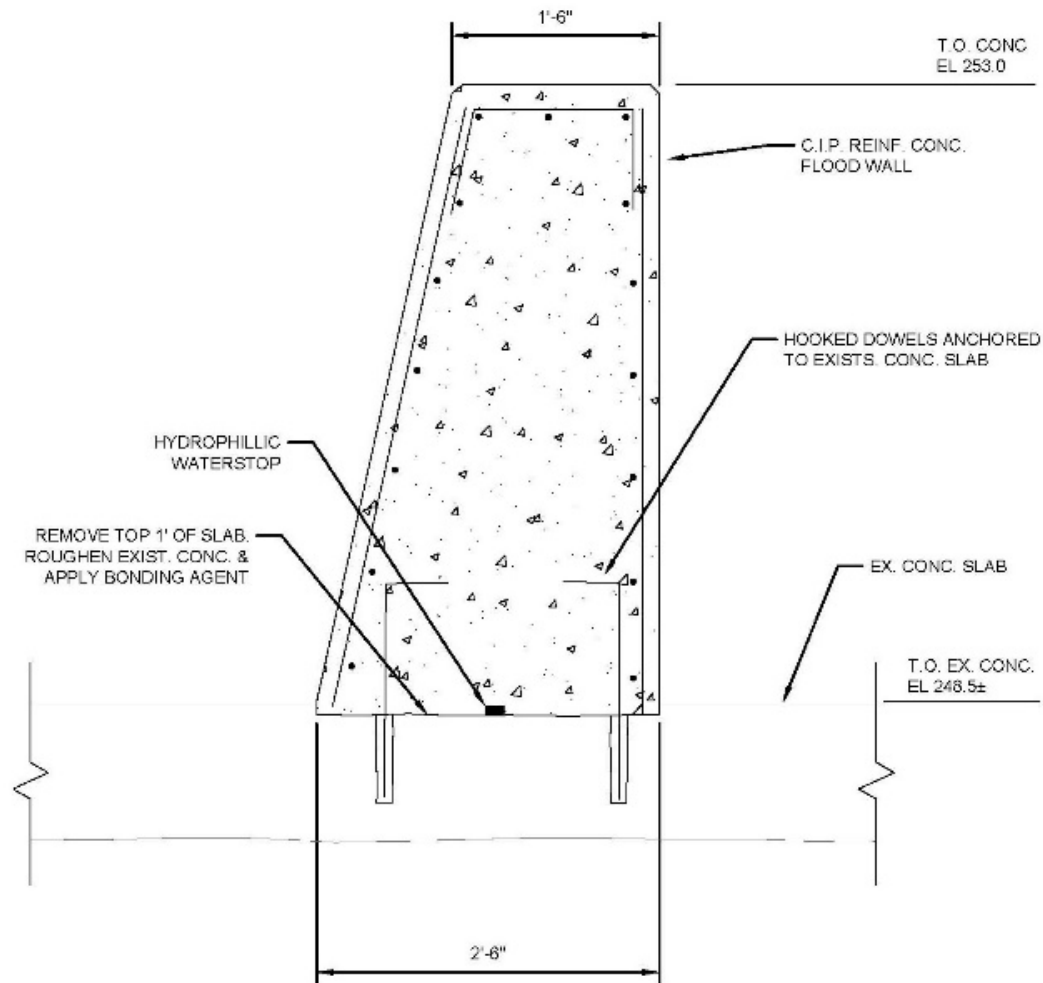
NYSDEC Fishing Access New Concrete Curb Typical Detail
